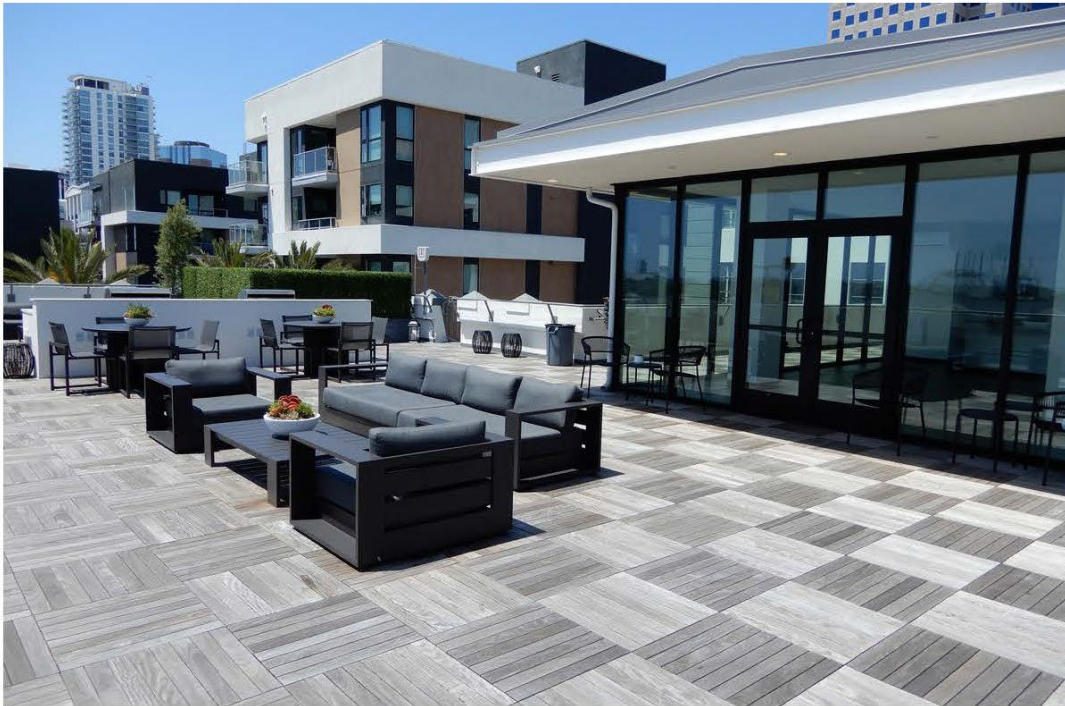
5th floor, roof deck with resident amenities, looking northwest
